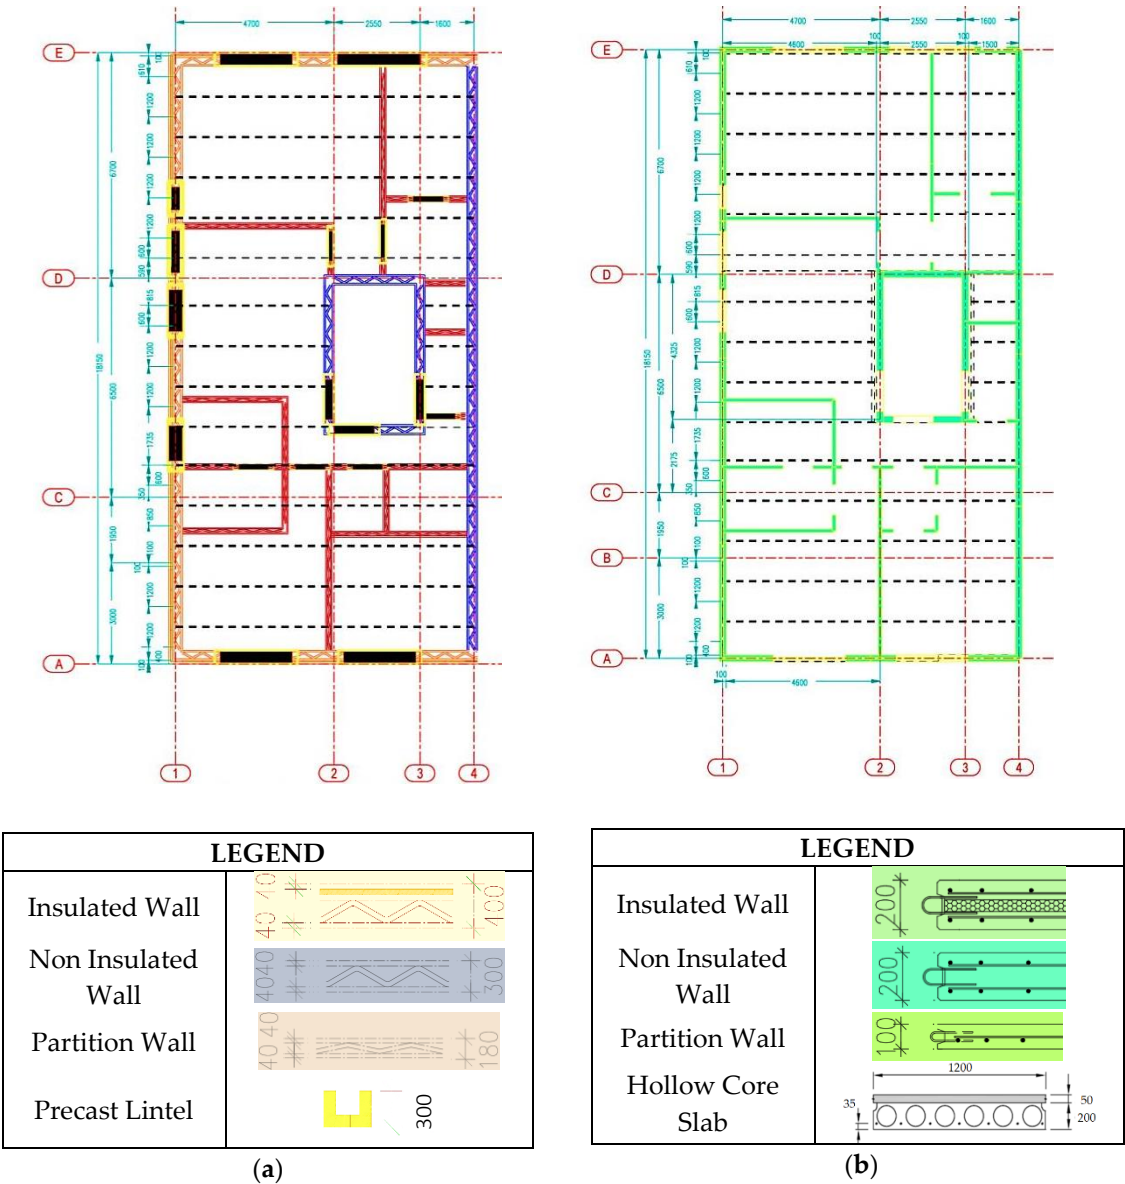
Plan View of Single Unit with Sections (a) 3DCP Building; (b) PC Building
